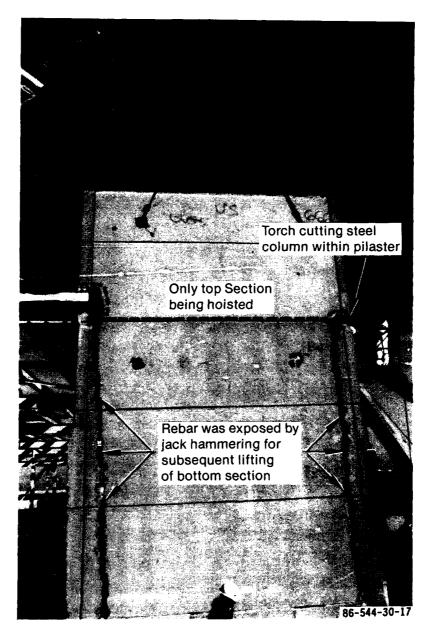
Hoisting top section of wall panel using the 75-ton crane.
